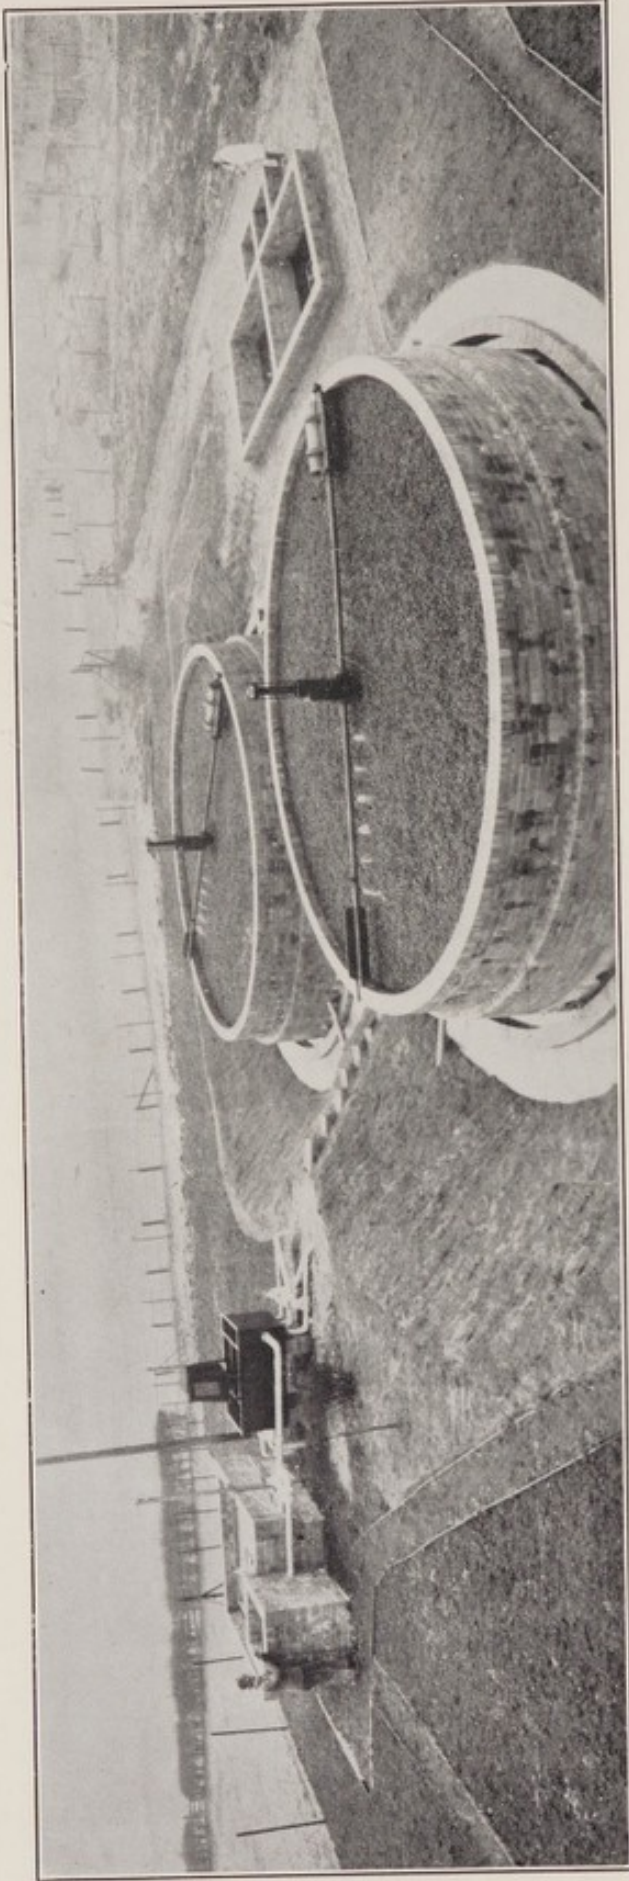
Panoramic View of Double-Filtration Plant, Ellesmere.
